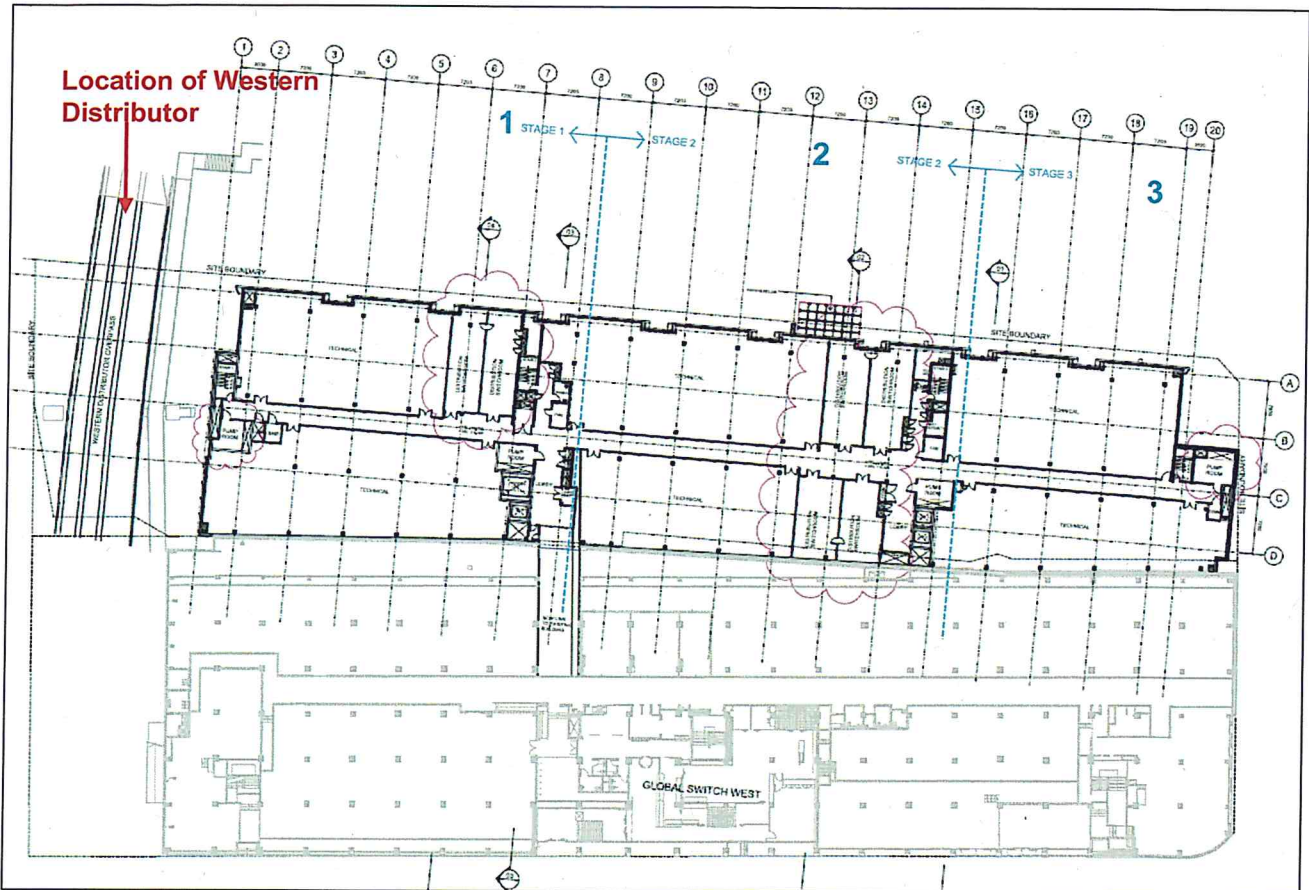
Proposed construction and progressive occupation stages (source: dem)
